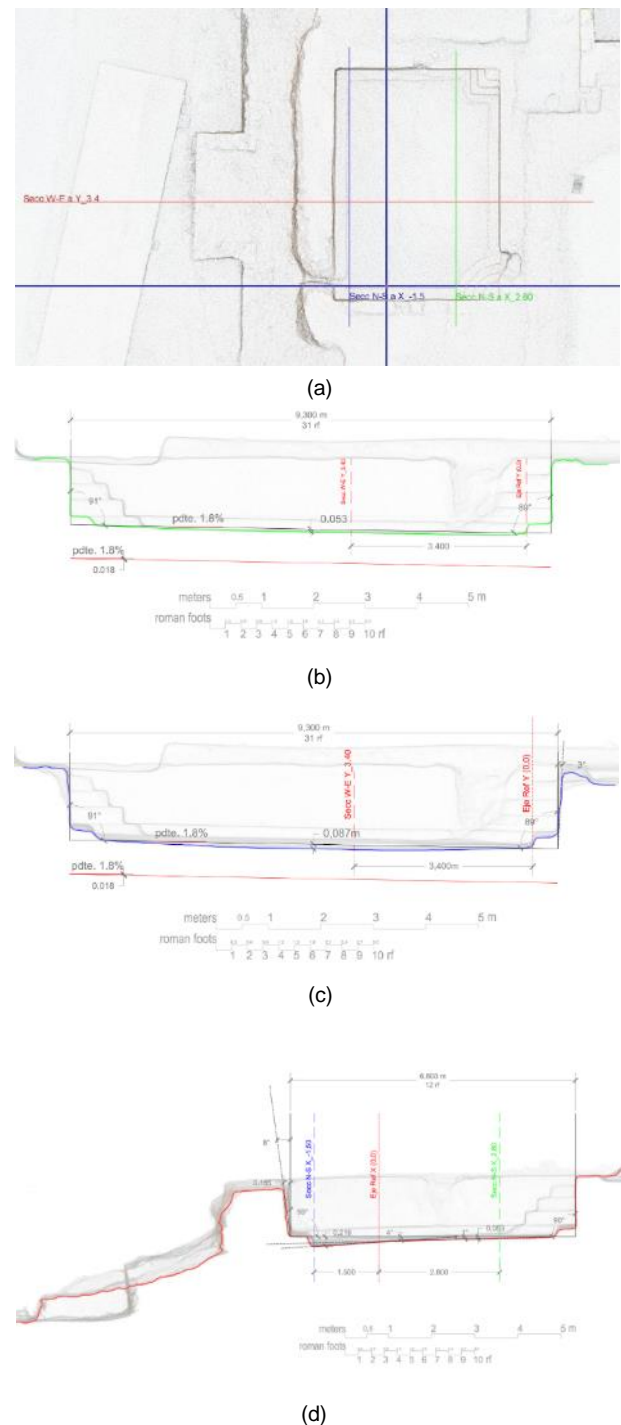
Plan and sections of the *natatio* drawn on a point cloud. Reference axes and section cut plans are included: a) Plan with section plans indicated; b) Section "A" North Southdirection in green colour next to steps; c) Section "B" North Southdirection in blue colour; d) Section "C" West Eastdirection in red colour.
